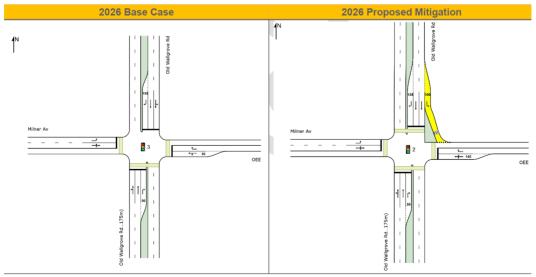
Proposed upgrade at Old Wallgrove Road/Millner Avenue intersection (Source: Ason Group)
